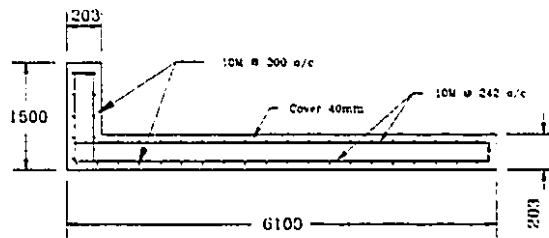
Layout of the low-rise building and the walls dimensions (Manatakos, 1989)
